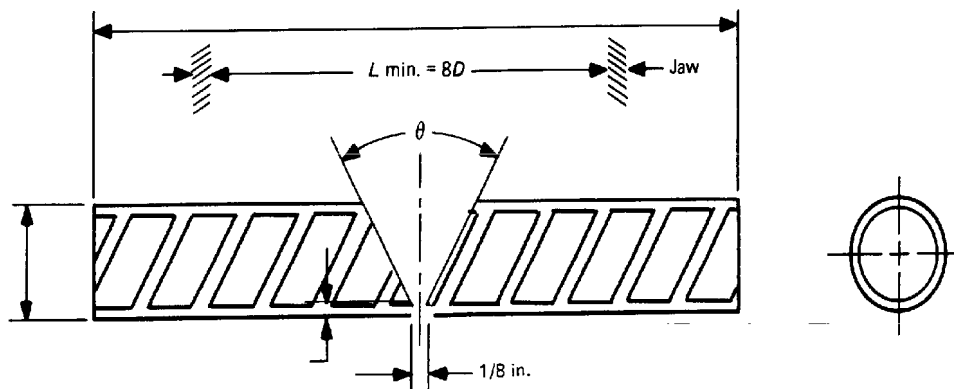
DIRECT BUTT SPLICE TEST POSITIONS FOR GROOVE WELDS
